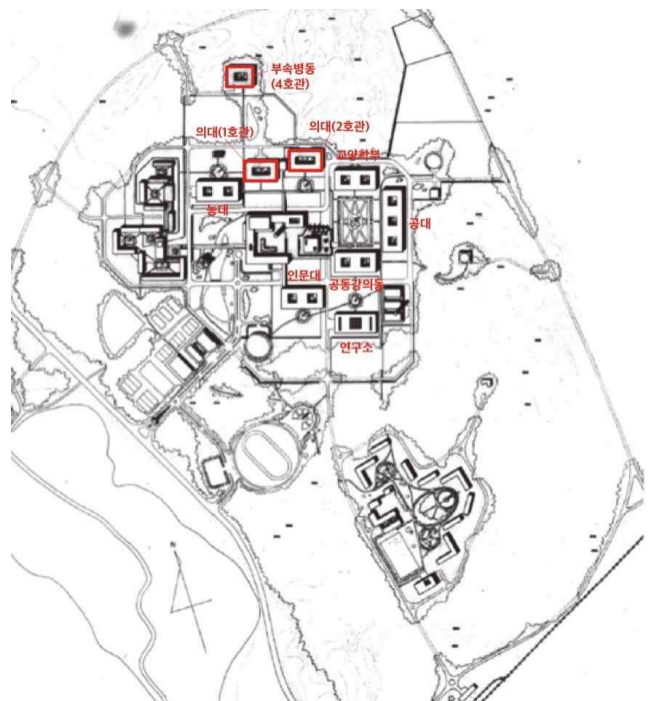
The Layout Plan of Yoon's Campus Plan, Edited by the authors (source: Same as Figure 3)
